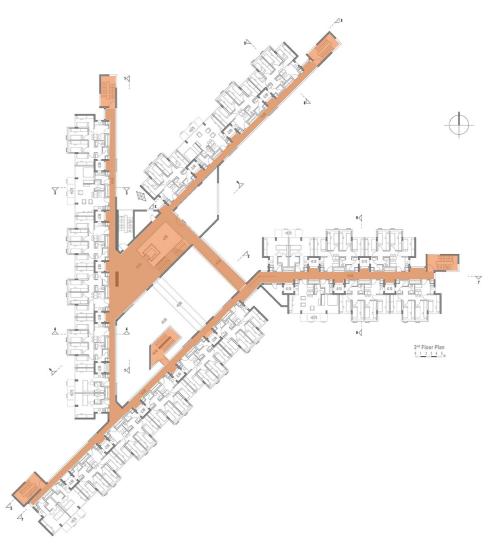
METU Graduate Students Guesthouse 2nd Floor Plan Source: Uygur Architects
